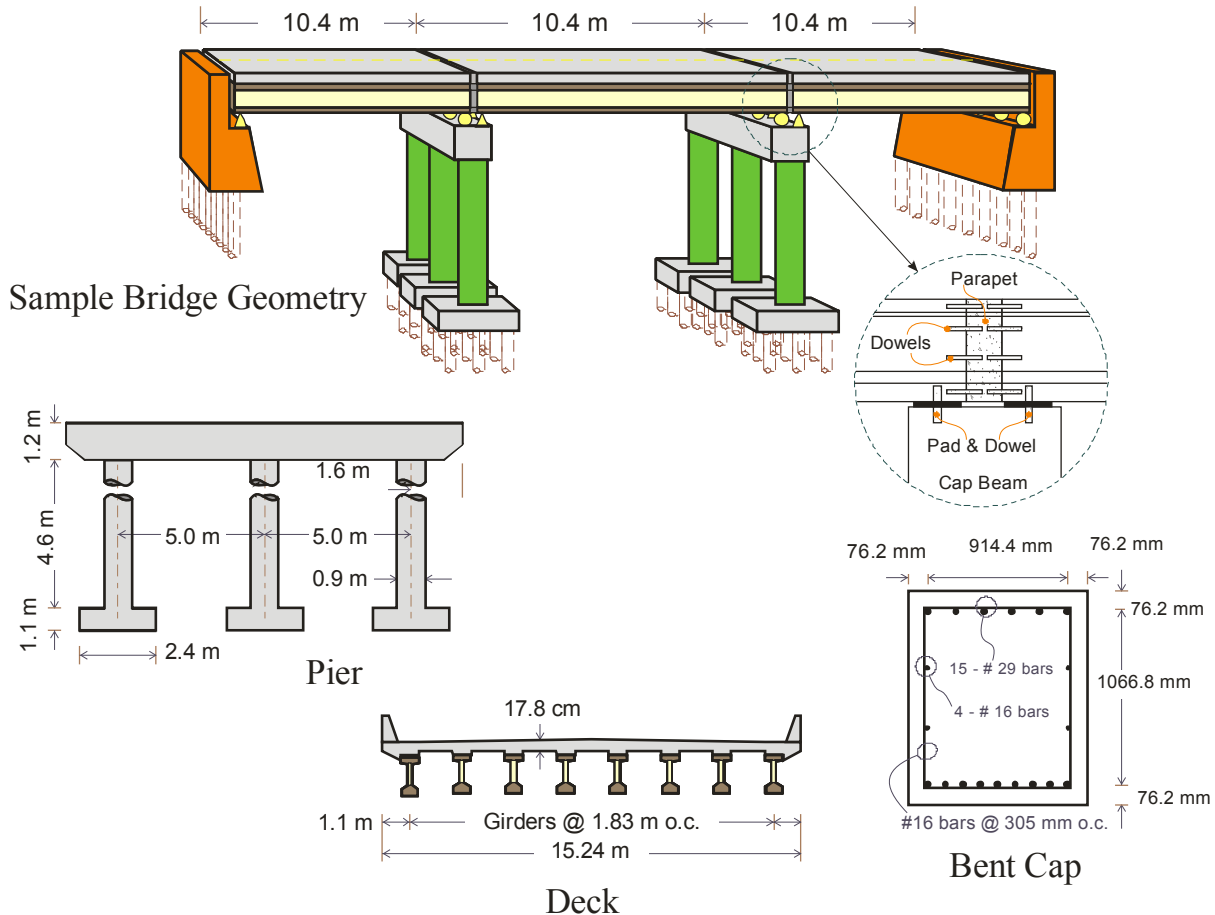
Typical layout of S-MSC and NS-MSC Concrete girder bridge.
